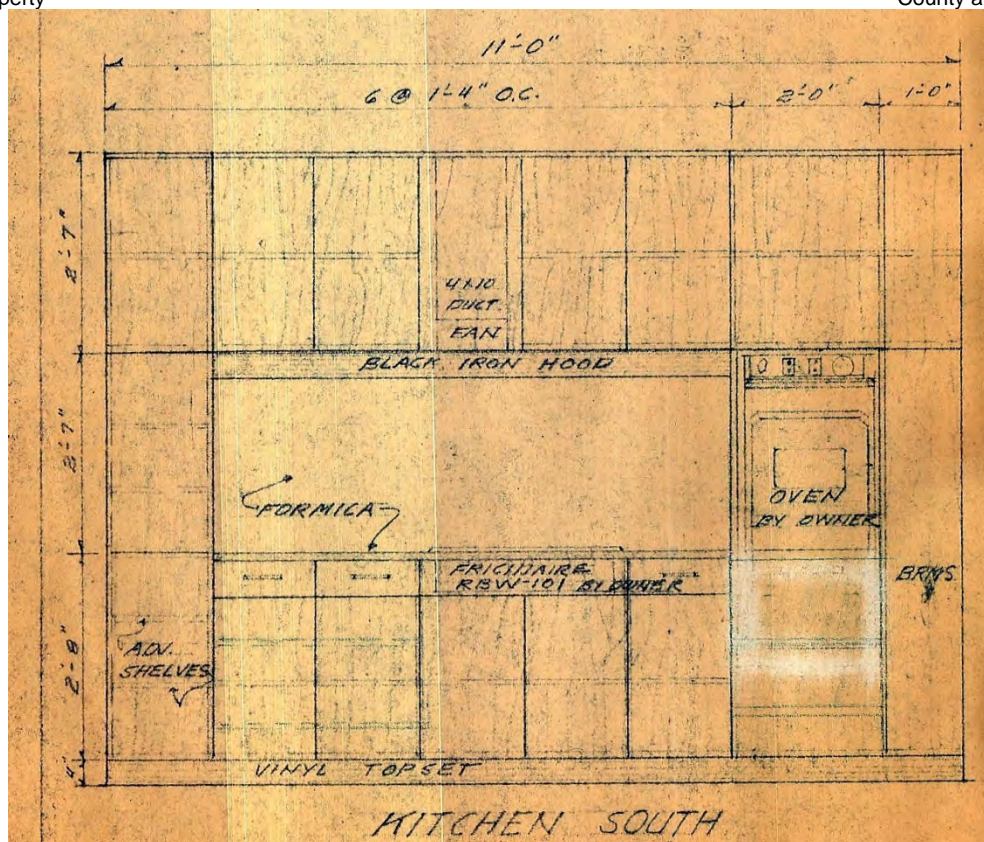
Original Blueprint depicting the first-floor galley kitchen design, south facing wall.³³
